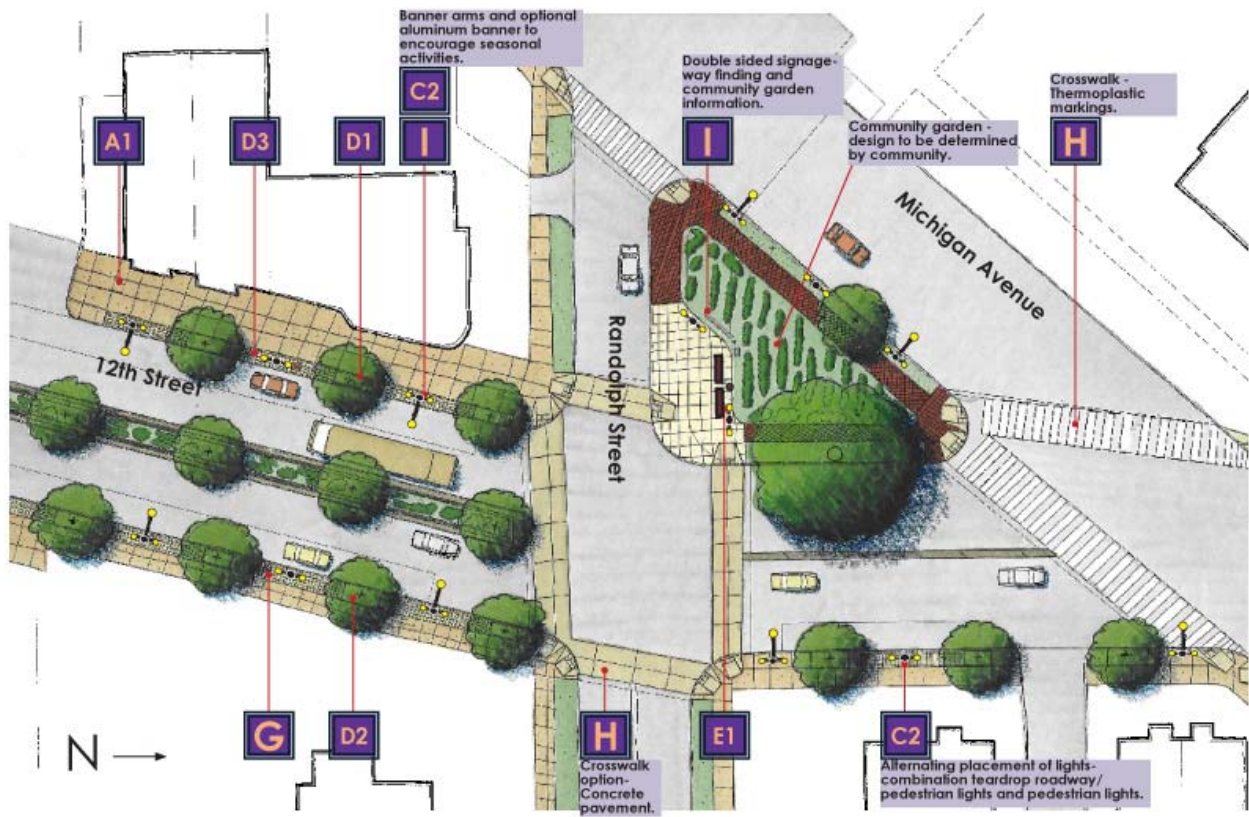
Conceptual Plan of Proposed Improvements along 12th Street between Michigan Avenue and Monroe Street (Page 116 of Draft Final Report).
